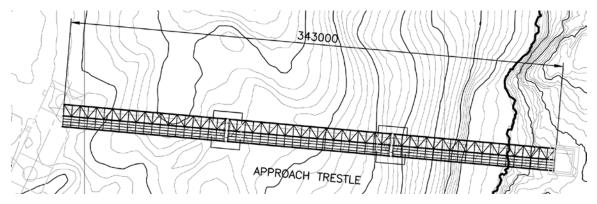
Plan, Approach 2 for Steensby Island Ore Trestle (see Appendix A)
